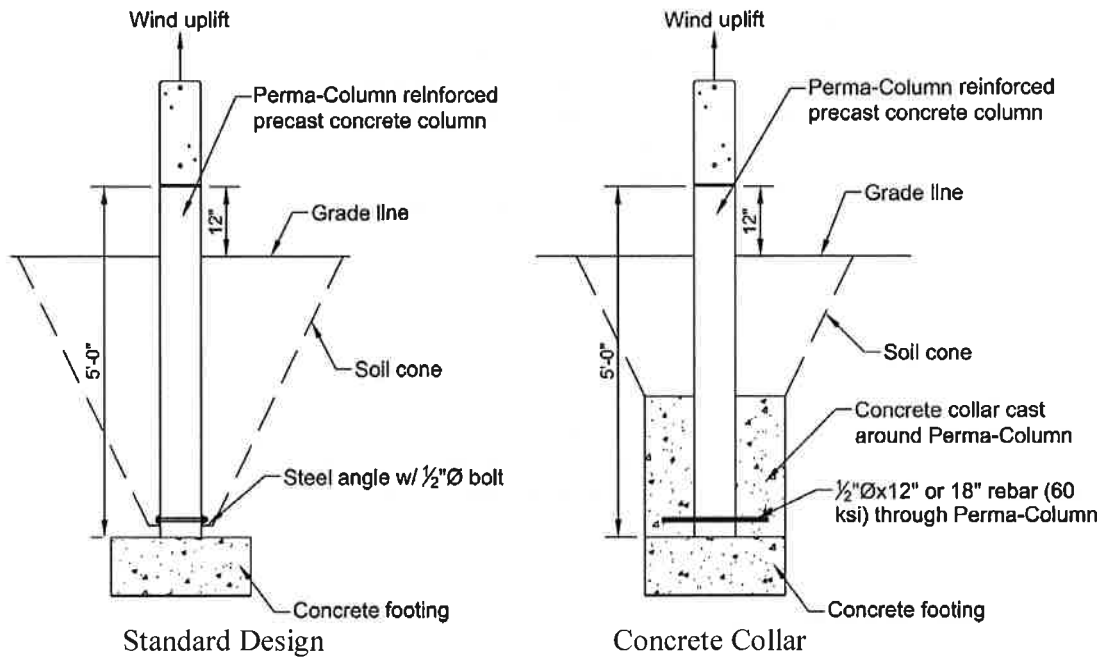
Standard Foundation and Foundation with Concrete Collar
